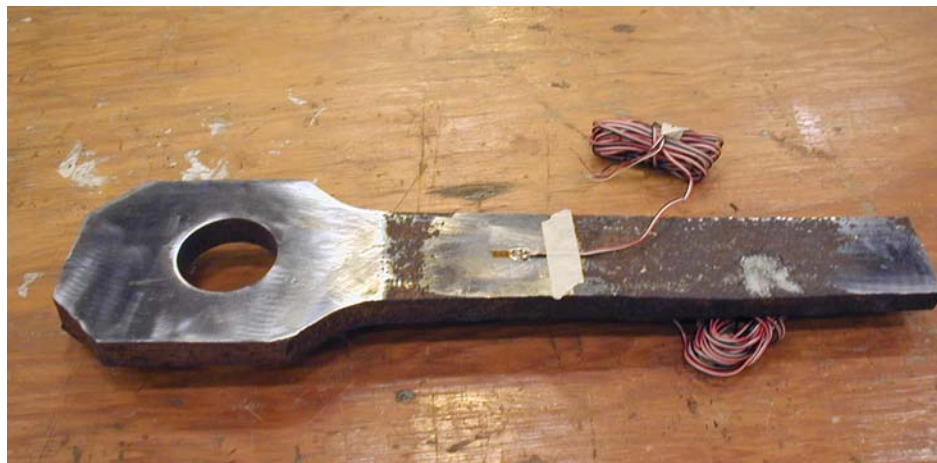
Eyebar End Connection A after Filler Weld Repair and Surface Grinding Completed
